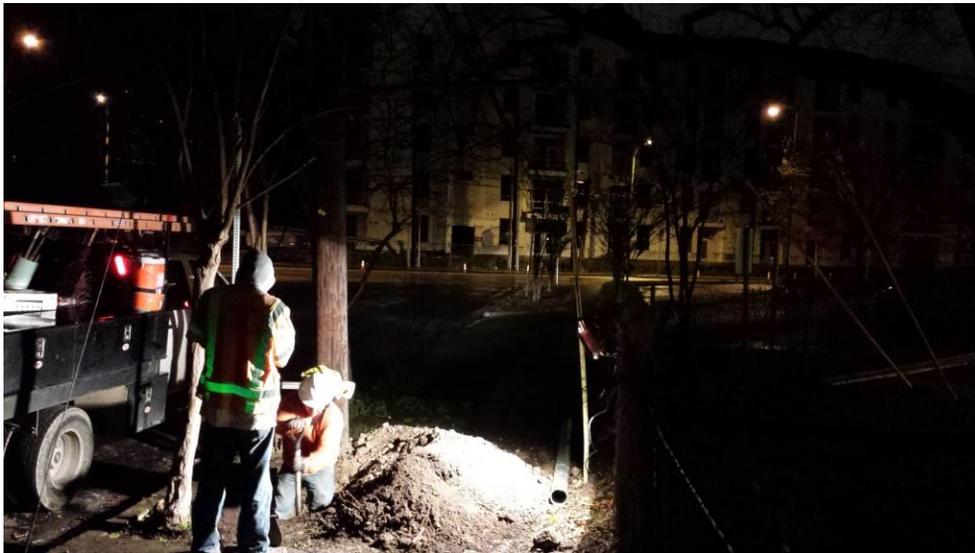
View north along Pancoast across excavation of Trench 2 towards Cesar Chavez Boulevard (lit area in background).
